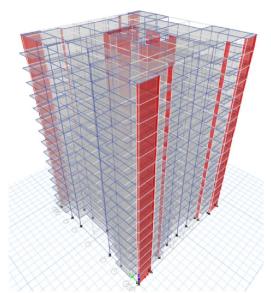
Structural Layout PlanFigure 2 3D View of G+15 Structural Wall + SMRFTable 2 Loading Parameters and Seismic definitions
